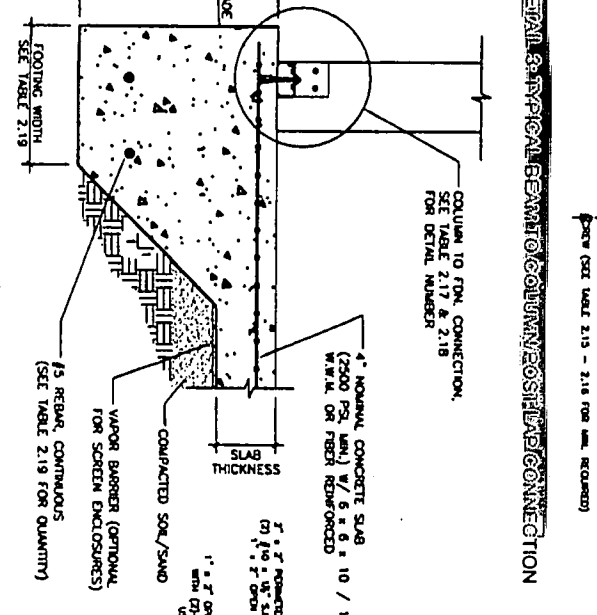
TYP. TURNDOWN SLAB FOOTING
